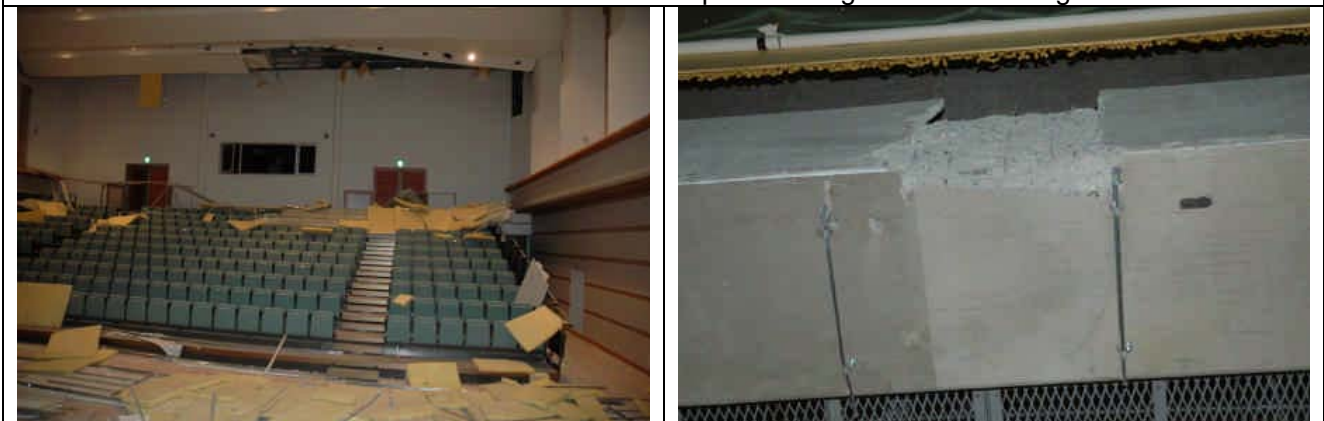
Fall of ceiling panels (left) and damage in the girder above the stage (right).
